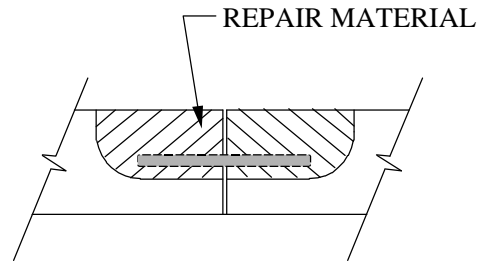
Construction procedures for retrofitted dowel bar installation.
